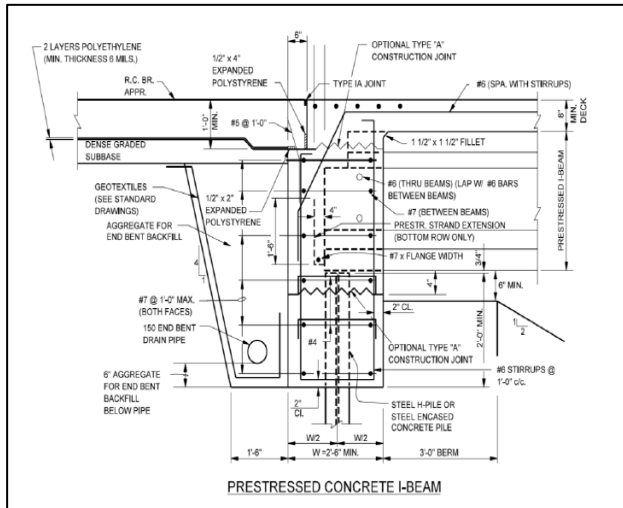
Typical Abutment Detail A (Frosch & Lovell, 2011)
